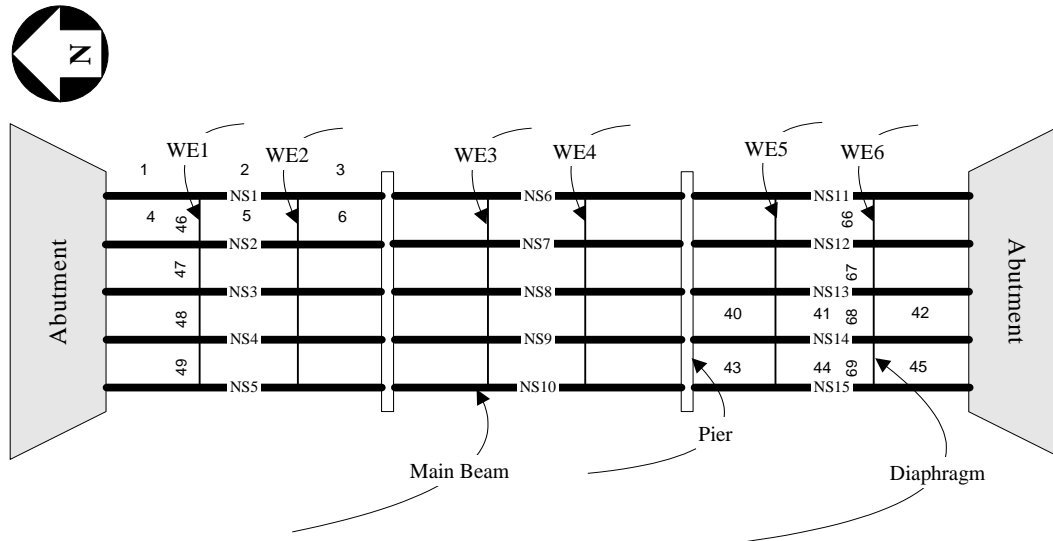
Statistical Plan Bridge Labeling Sequence (View II)
